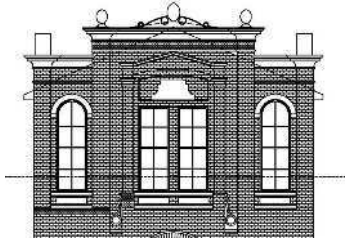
Proposed rear addition to house an enclosed fire exit stair.
